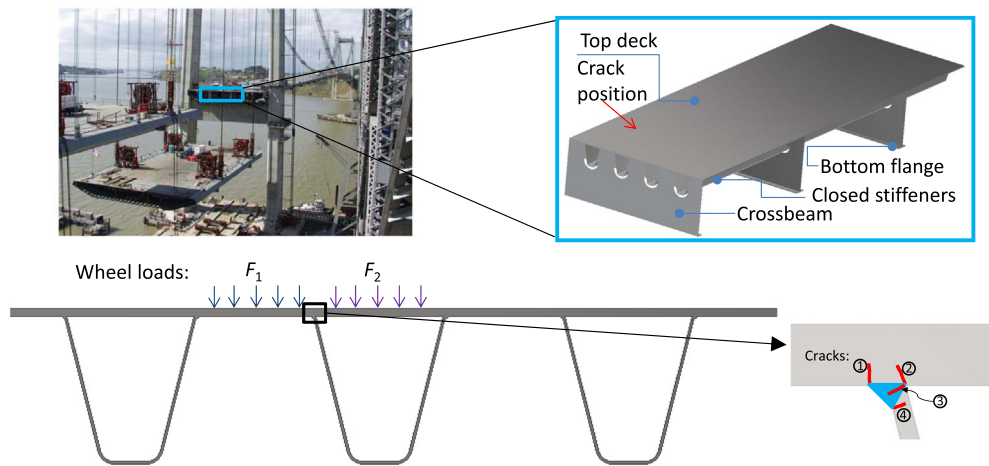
Sketch of an orthotropic steel deck and rib-to-deck cracks (the photo of the bridge in construction is reprinted from the “FHWA” report with permission [1]).
